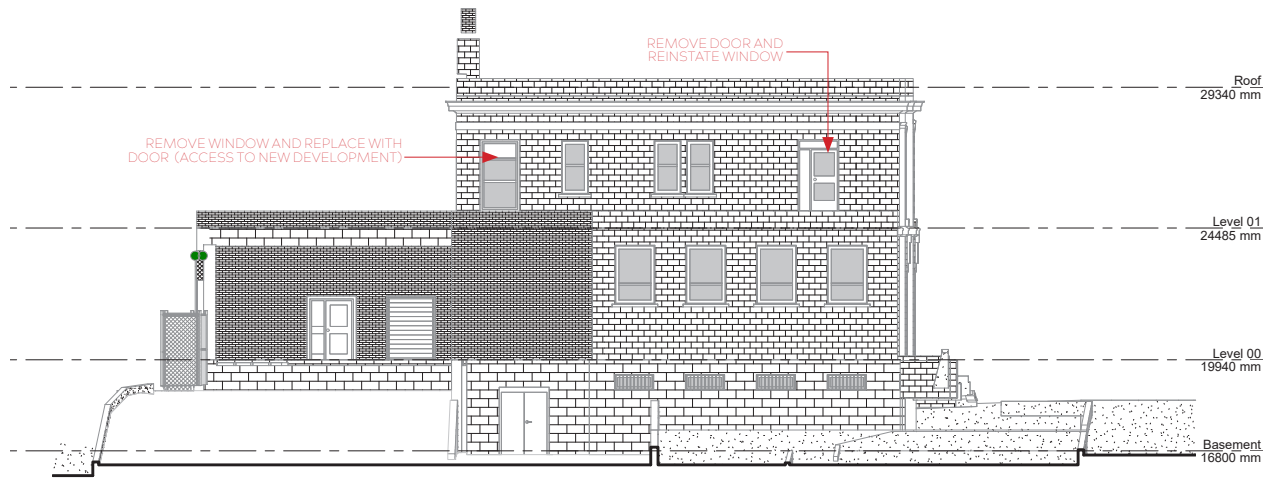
SOUTHWEST WINDOW OPENING TO BE MODIFIED
